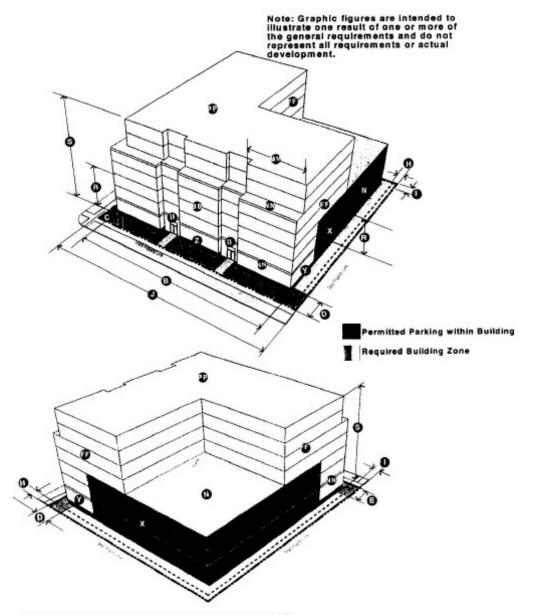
R: CORRIDOR BUILDING TYPE DIAGRAM.
